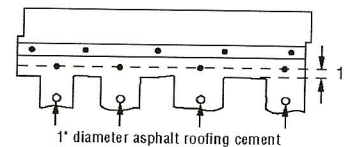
Fastening Presidential and Presidential TL Shake shingles on steep slopes.
